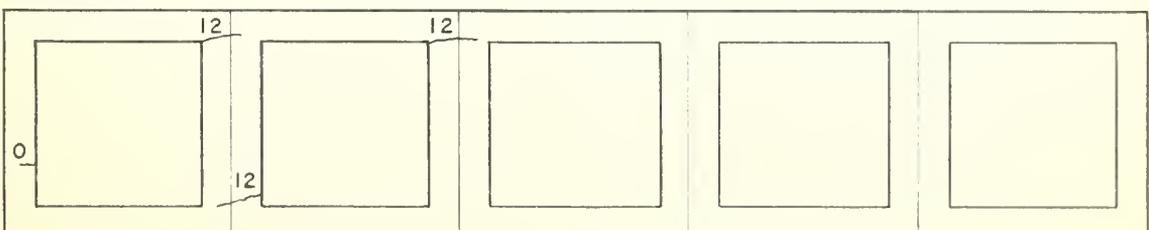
CRACK PATTERN IN BEAMS NO.19 & 20
